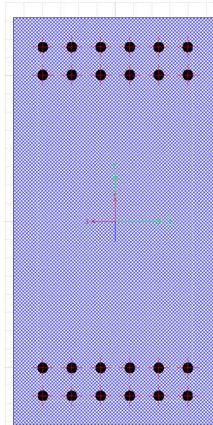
Cross sections of concrete beams in SAP2000 Section Designer
